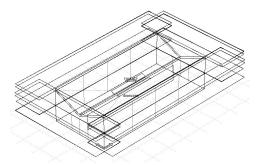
The considered V-shaped building model geometry, with solar shadings.
